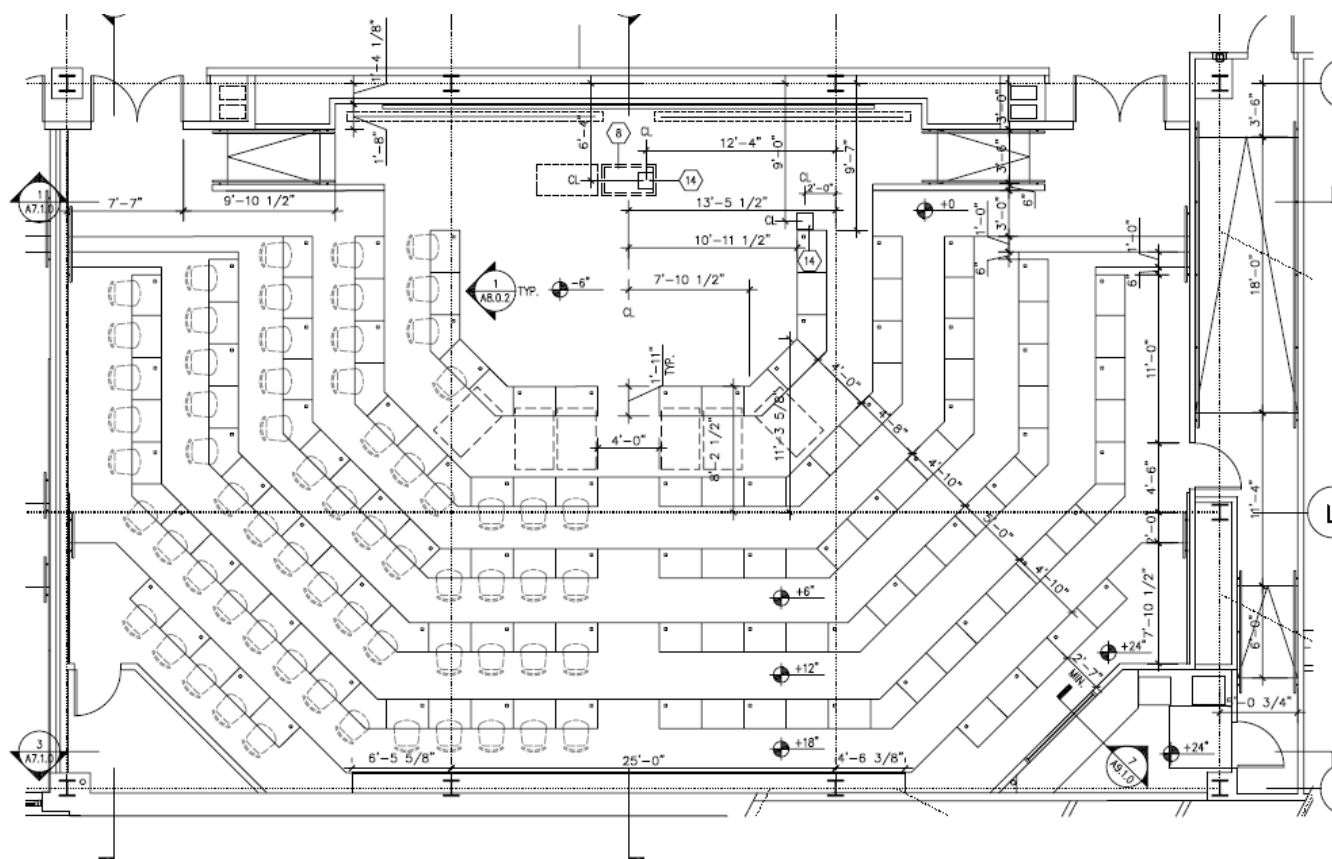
135-Seat Classroom Floor Plan
